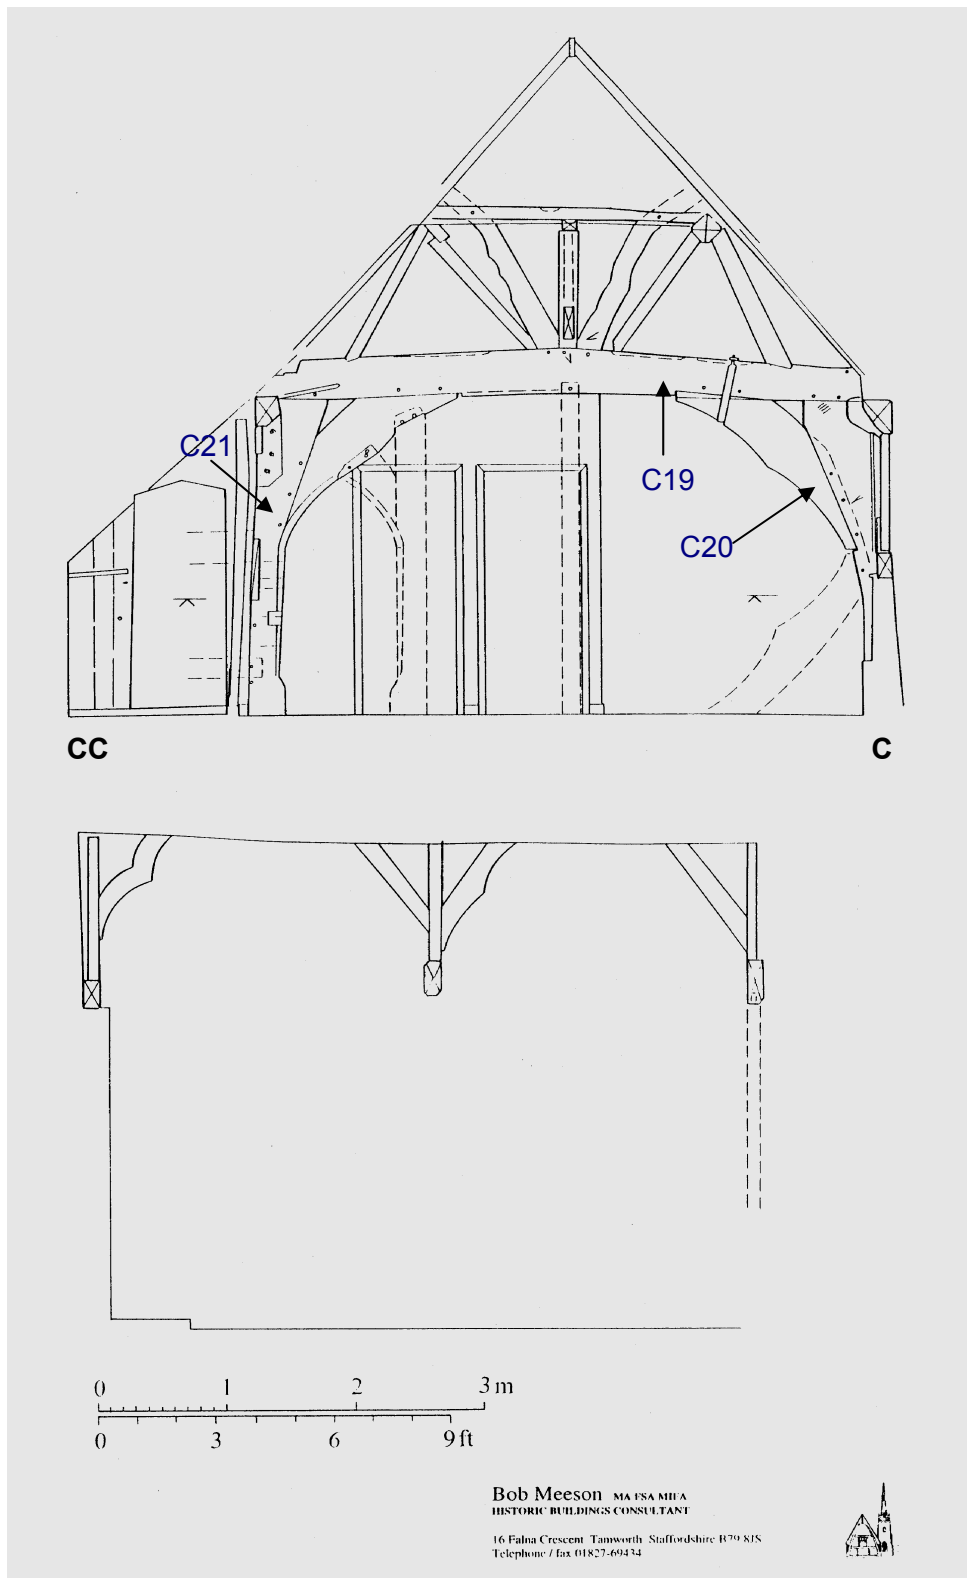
Gatehouse; drawing to show sample locations from truss C (viewed looking west) (after Jean and Bob Meeson)
